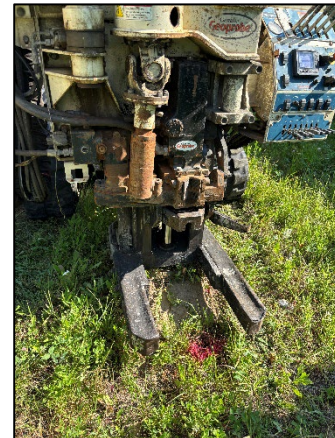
Viewing 14002 SB02 Drilling, Facing West.
